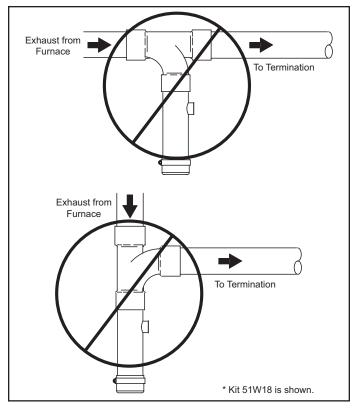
Crawl Space Vent Pipe Drain Trap Assembled Incorrectly
